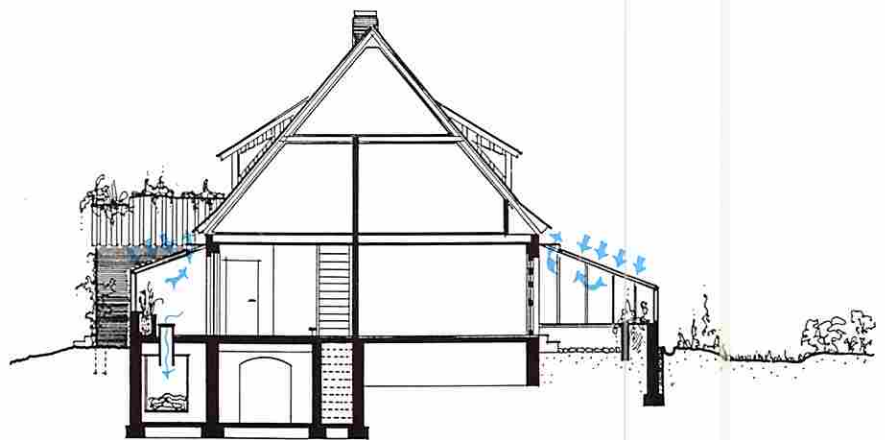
Cross-section through east and west greenhouses of Phase 1 Building
